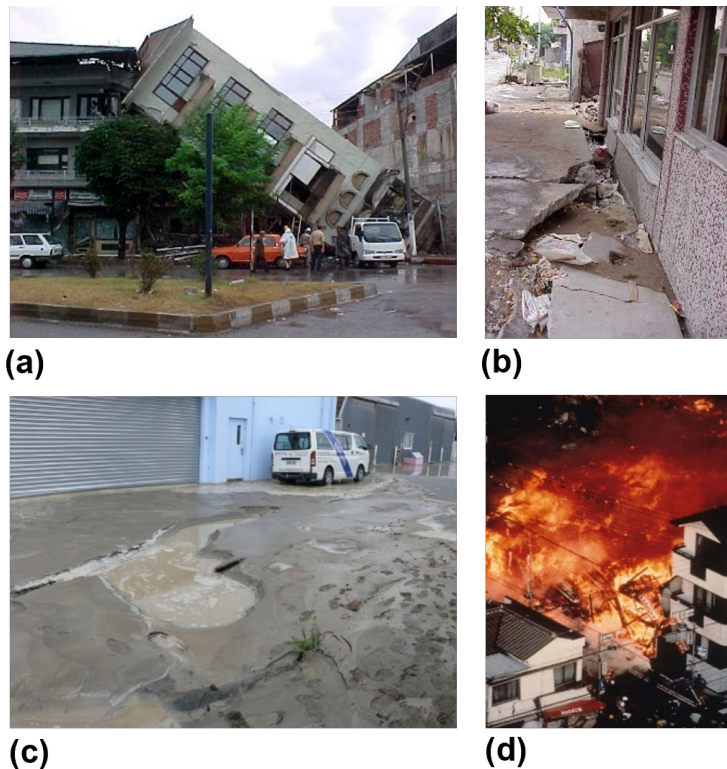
Buildings damaged by liquefaction: (a) overturned 5-story building in Adapazari, (b) laterally displaced and settled building in Adapazari, (c) ejecta affecting building in Christchurch, and (d) fire in Kobe (Bray et al. 2004, 2014a, Akai et al. 1995).
